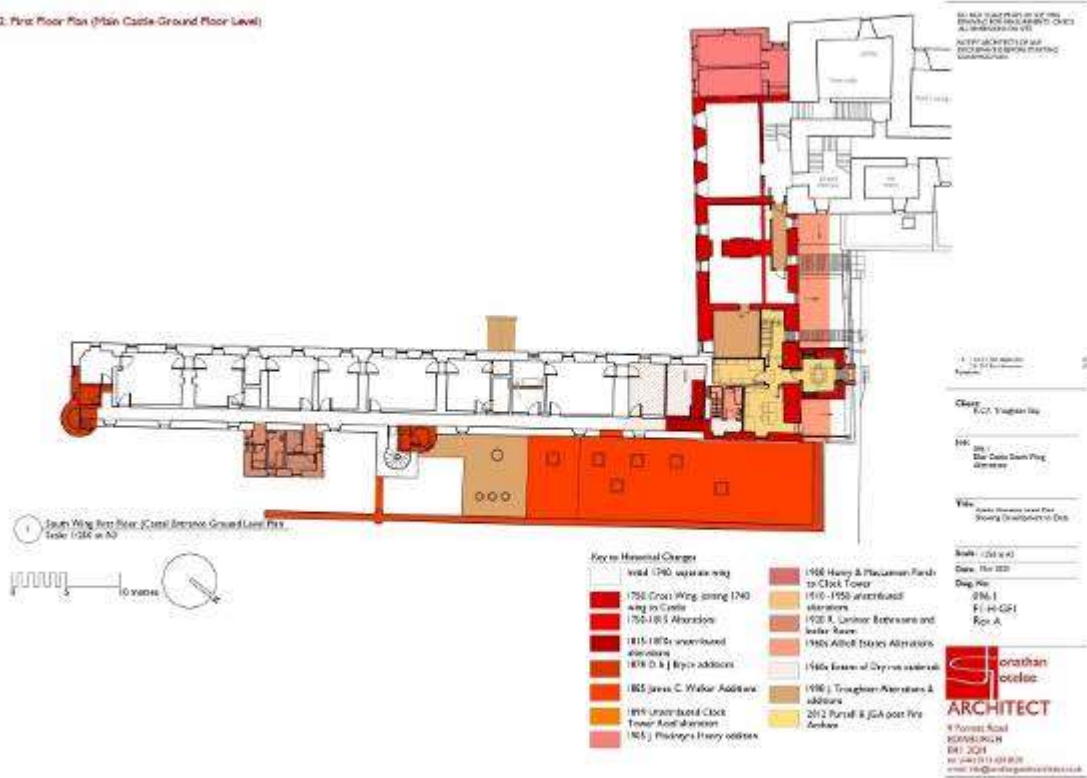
Representation of the areas altered & when they were made. First Floor Plan (Main Castle Ground Floor Level).
